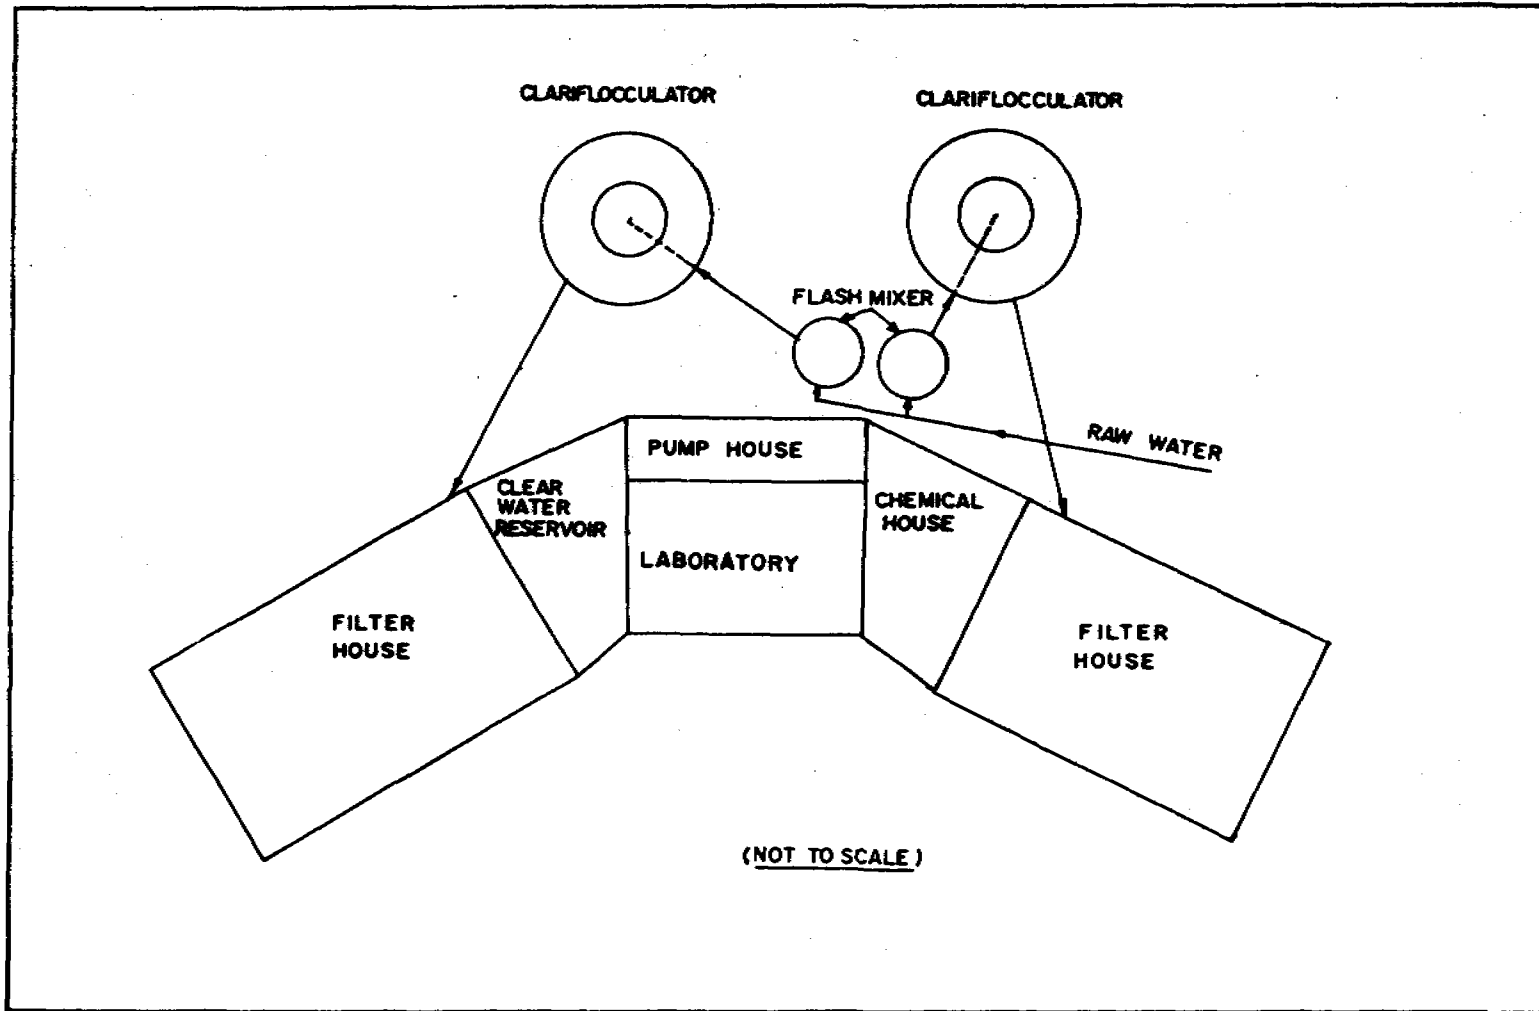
LAYOUT PLAN OF TRIVANDRUM WATER TREATMENT PLANT - ARUVIKKARA
